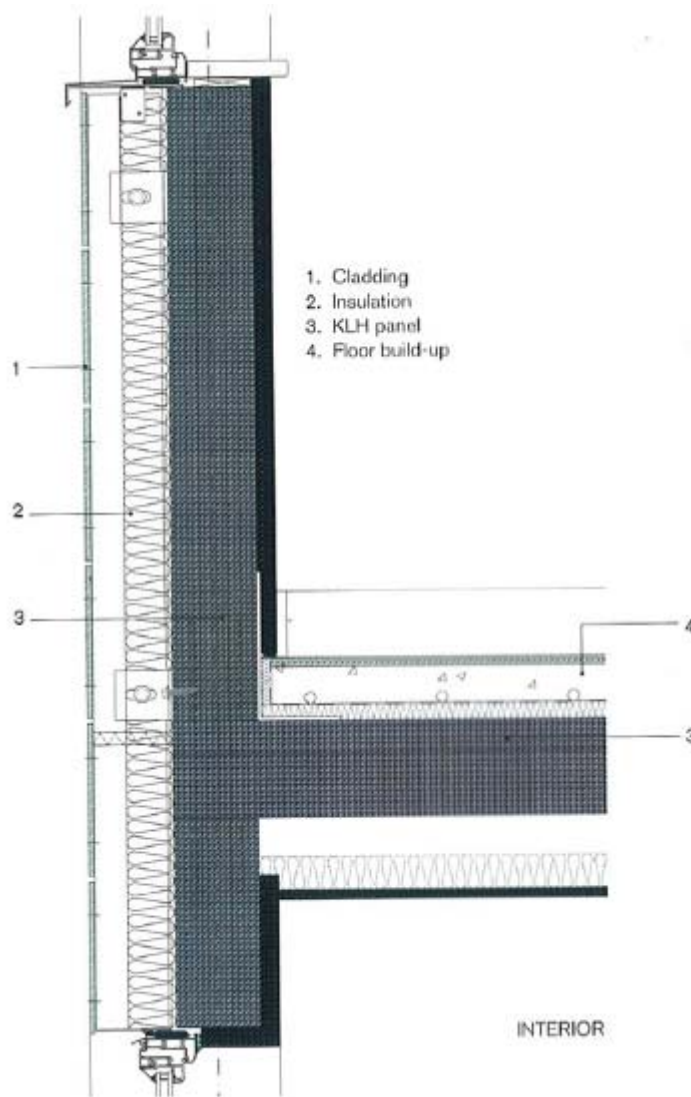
Cross-Section through Stadthaus CLT Floor to Wall Junction
